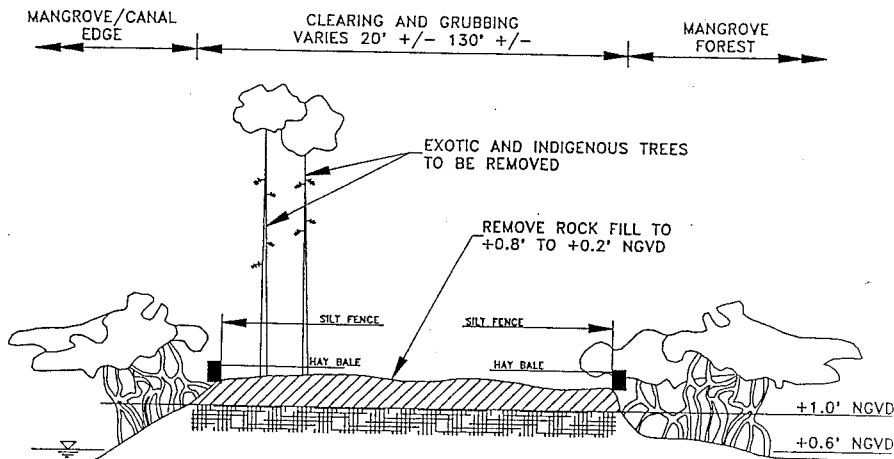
The revised design cross section of the mangrove mitigation area excavation at the Harrison Tract (note the placement of very specific elevations relative to national geodetic vertical datum (NGVD)).
